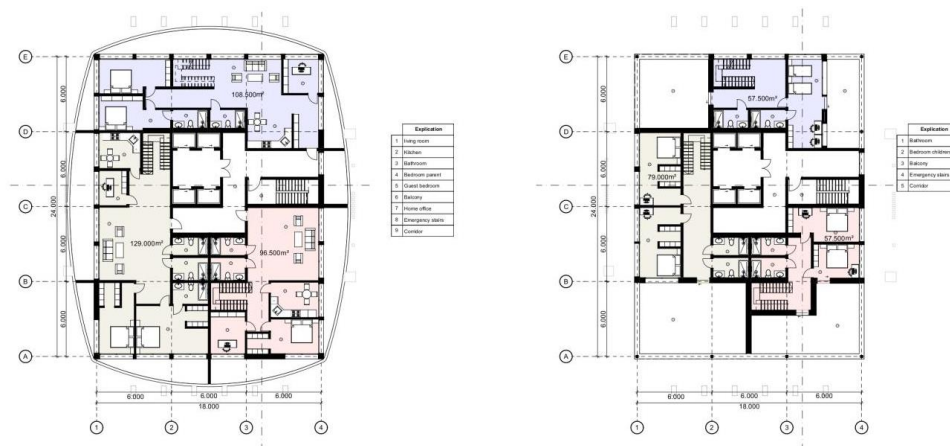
Duplex Penthouse Floor Plans (18th and 19th floors)
